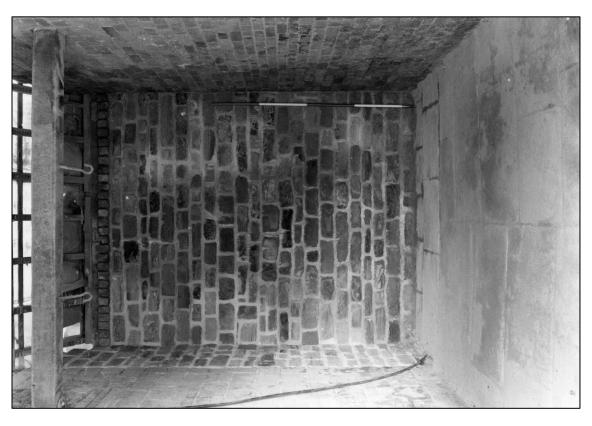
East wall of north room, looking E (photo 3/1) (top to left).
